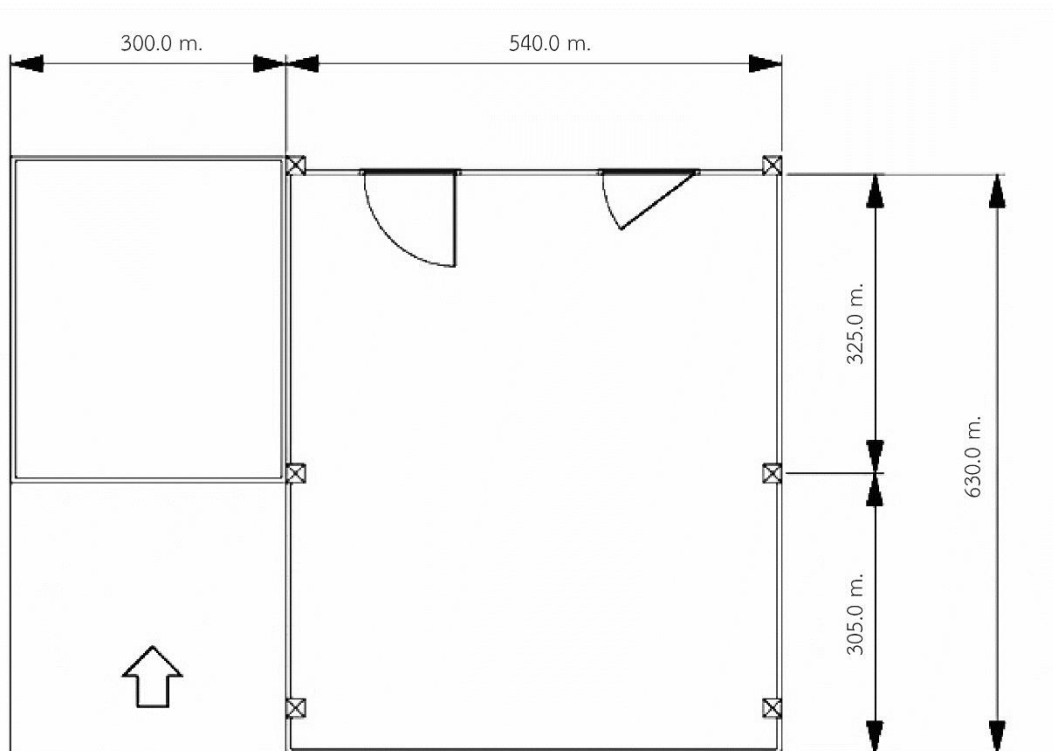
shows the size of Khiri Wongkot weaving group 1 area.
